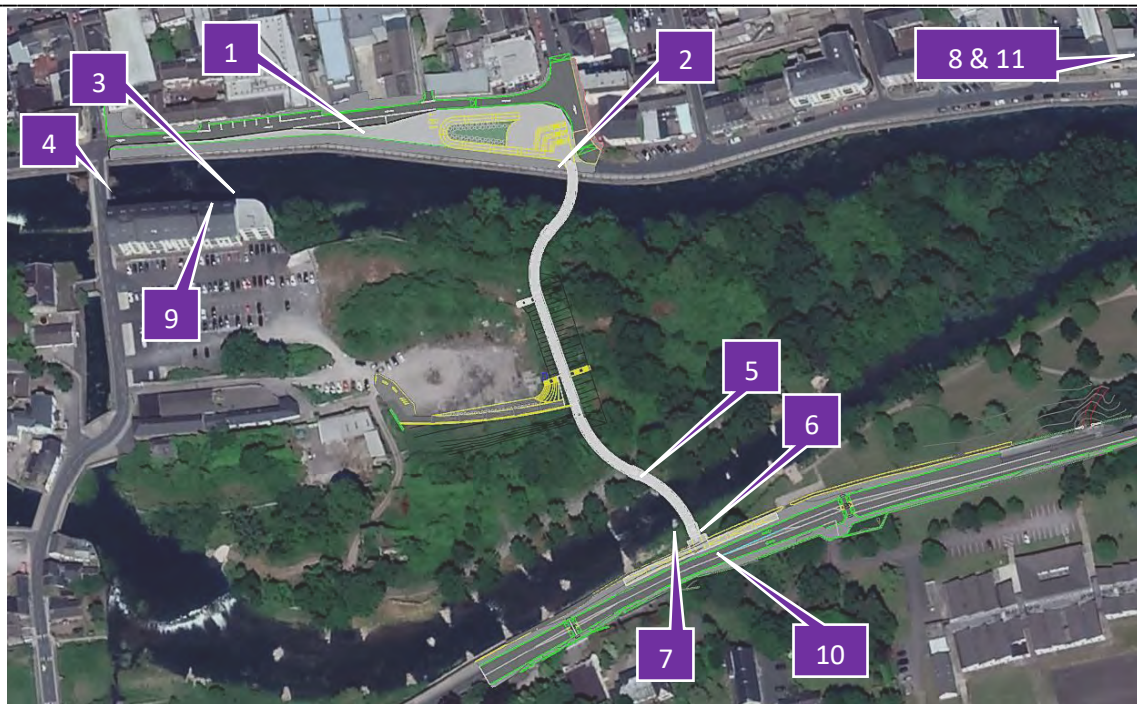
Aerial view with proposed bridge crossings and photograph locations
